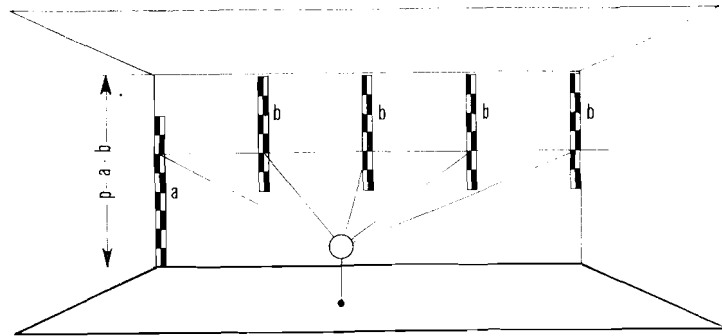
Levelling instruments used altimetrically for transferring readings from storey to storey.
